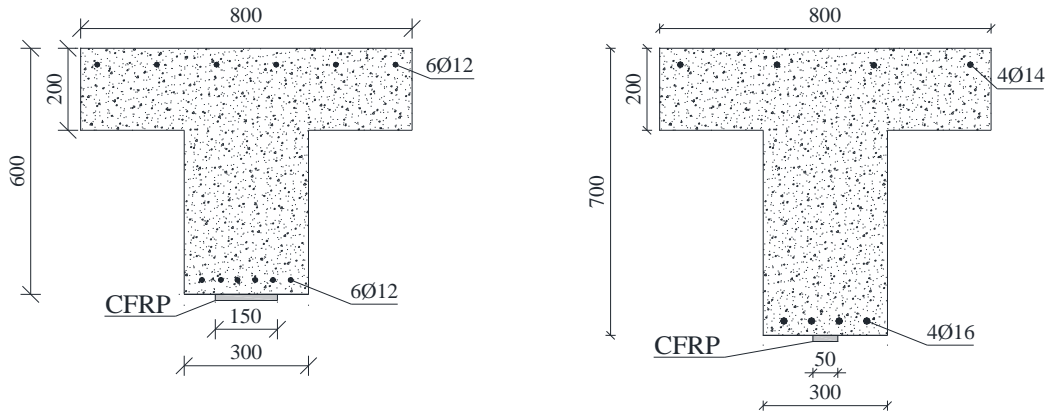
Beams cross-section, C2 (left) and C3 (right) FRP configuration (dimensions in mm).
